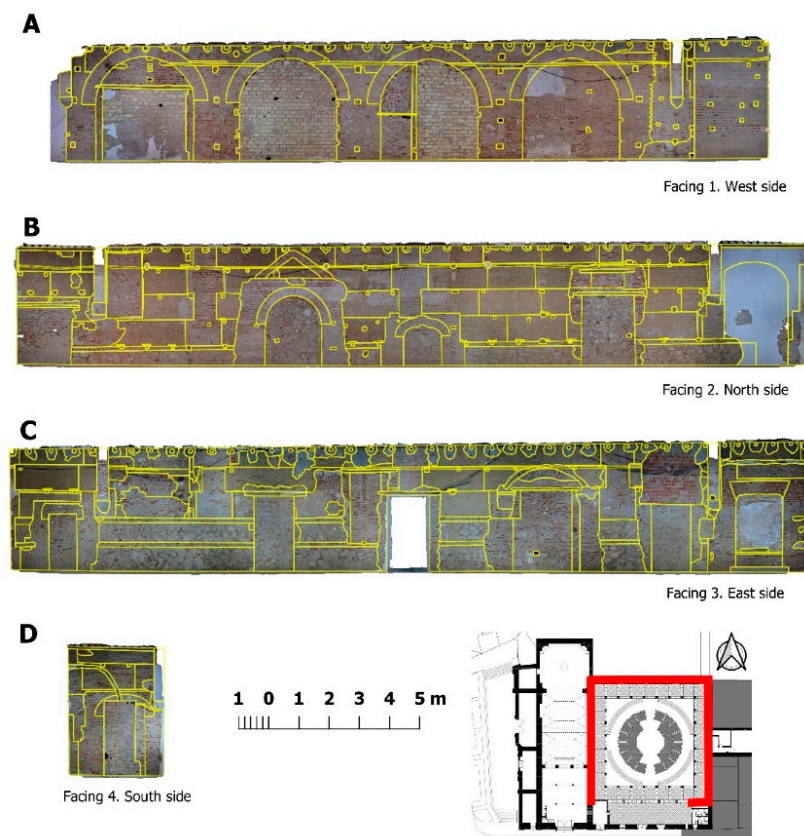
Documented building components: (A) west wall, (B) north wall, (C) east wall, (D) south wall.
